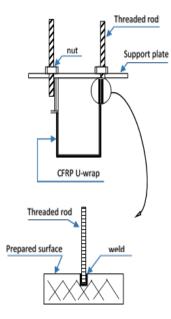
Alam: Transverse U-shaped anchor²⁹.
